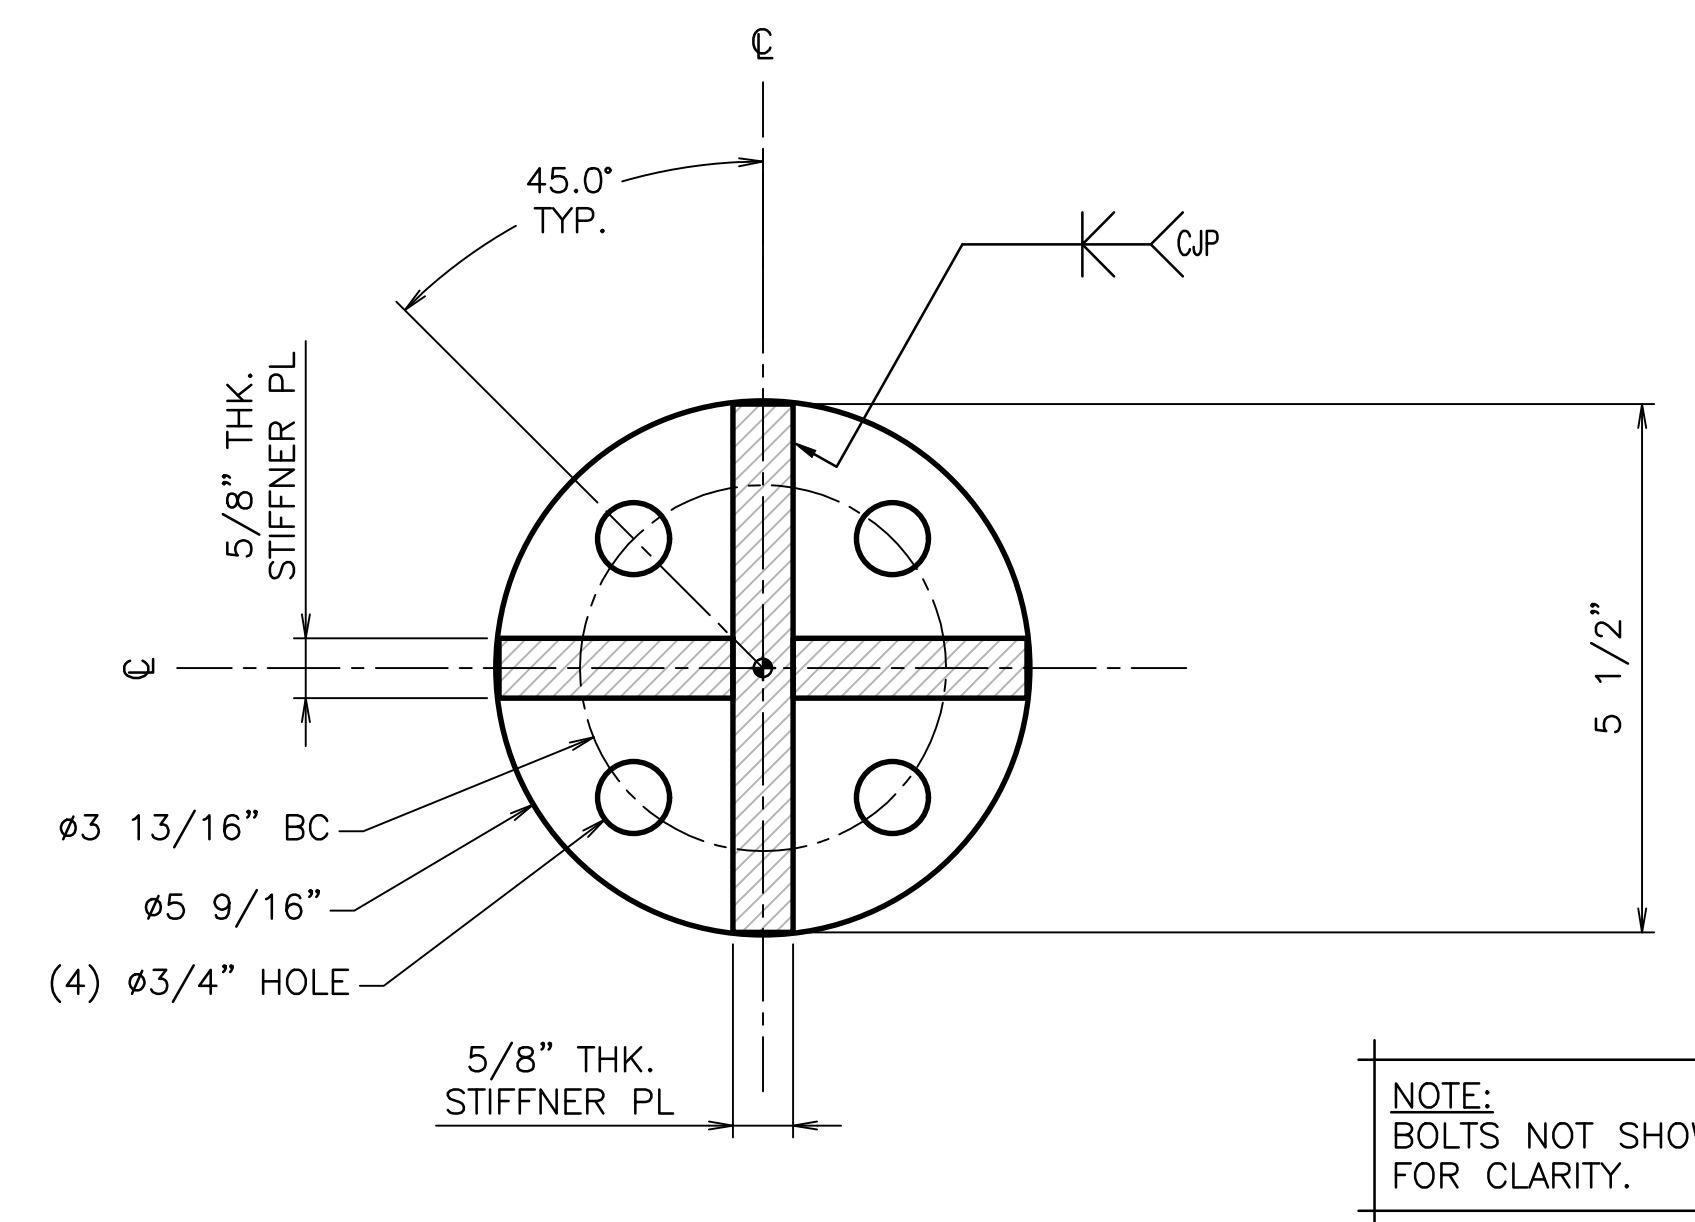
TYPE 1 DIABLO CONNECTION
